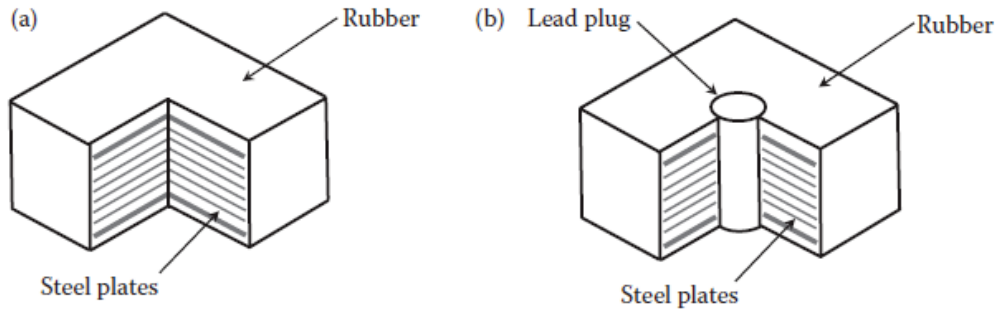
Steel-laminated elastomeric bearing (a) and lead-rubber bearing (b) [7]
